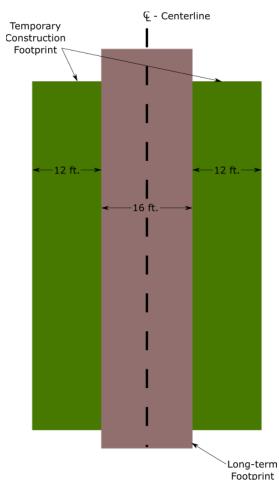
Access Road Long-term and Temporary Footprints.
